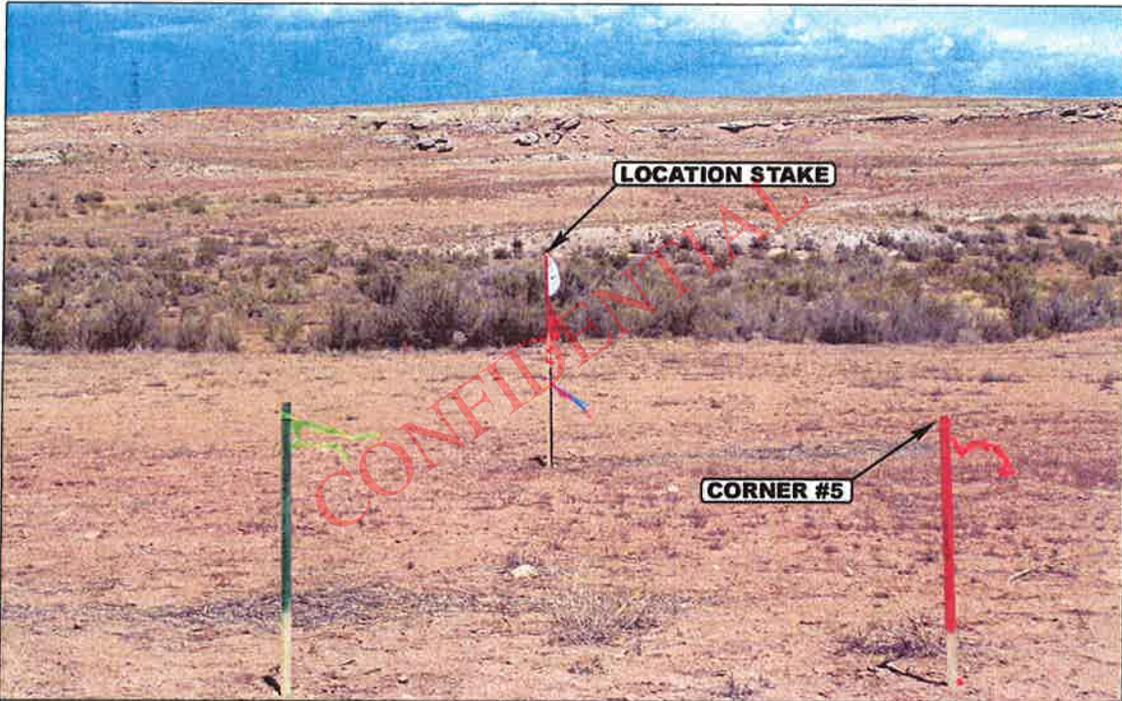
PHOTO: VIEW FROM CORNER #5 TO LOCATION STAKE
